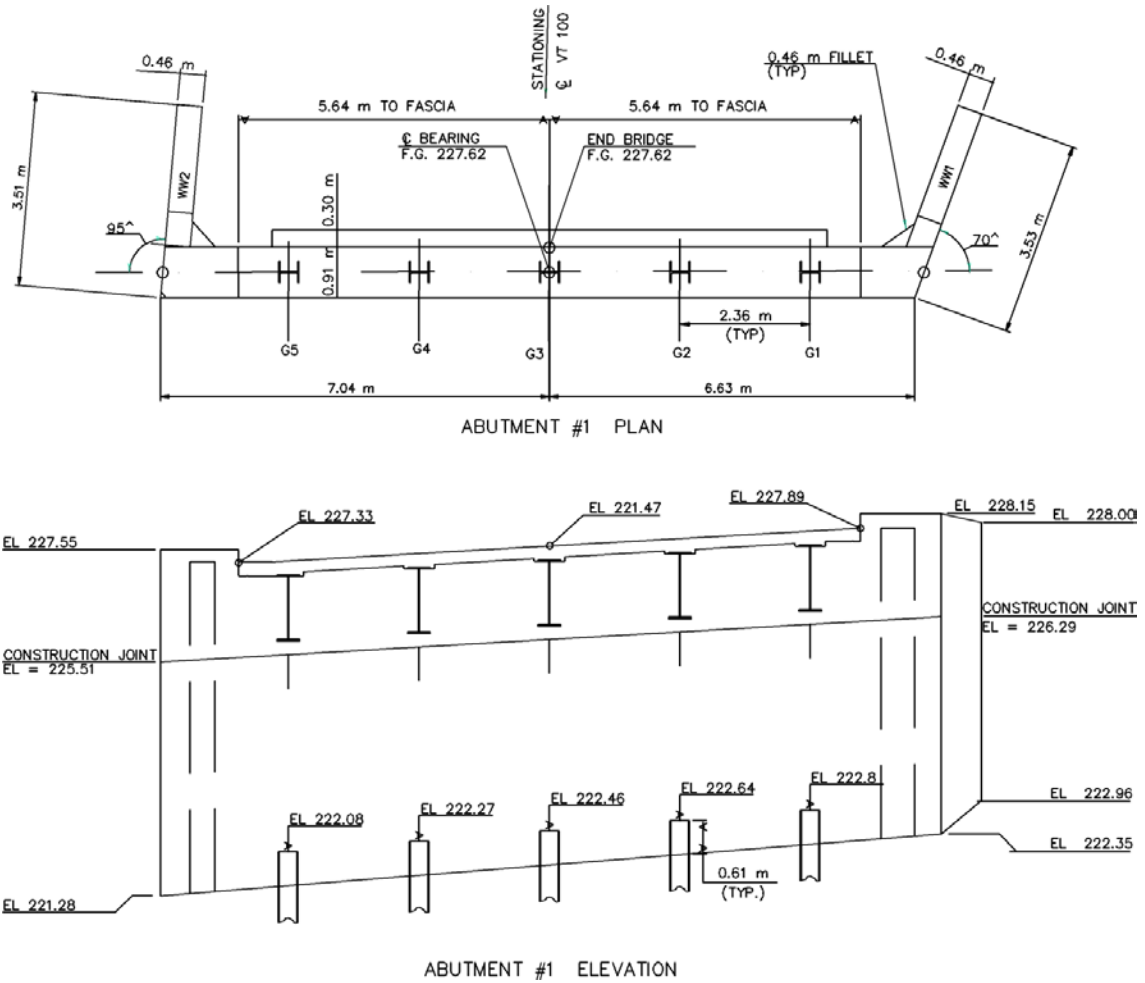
Plan and Elevation View of Abutment 1 at Stockbridge Bridge
